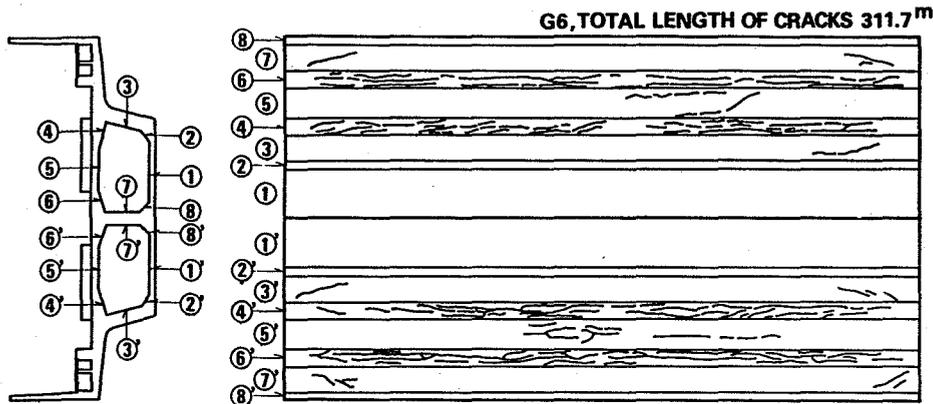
Crack illustration of the inner wall of the girder box
